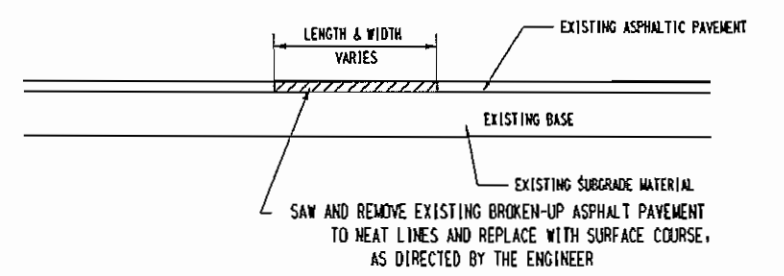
DETAILS OF REPAIRING EXISTING PAVEMENT PRIOR TO RESURFACING FOR FULL DEPTH AND MILLING
